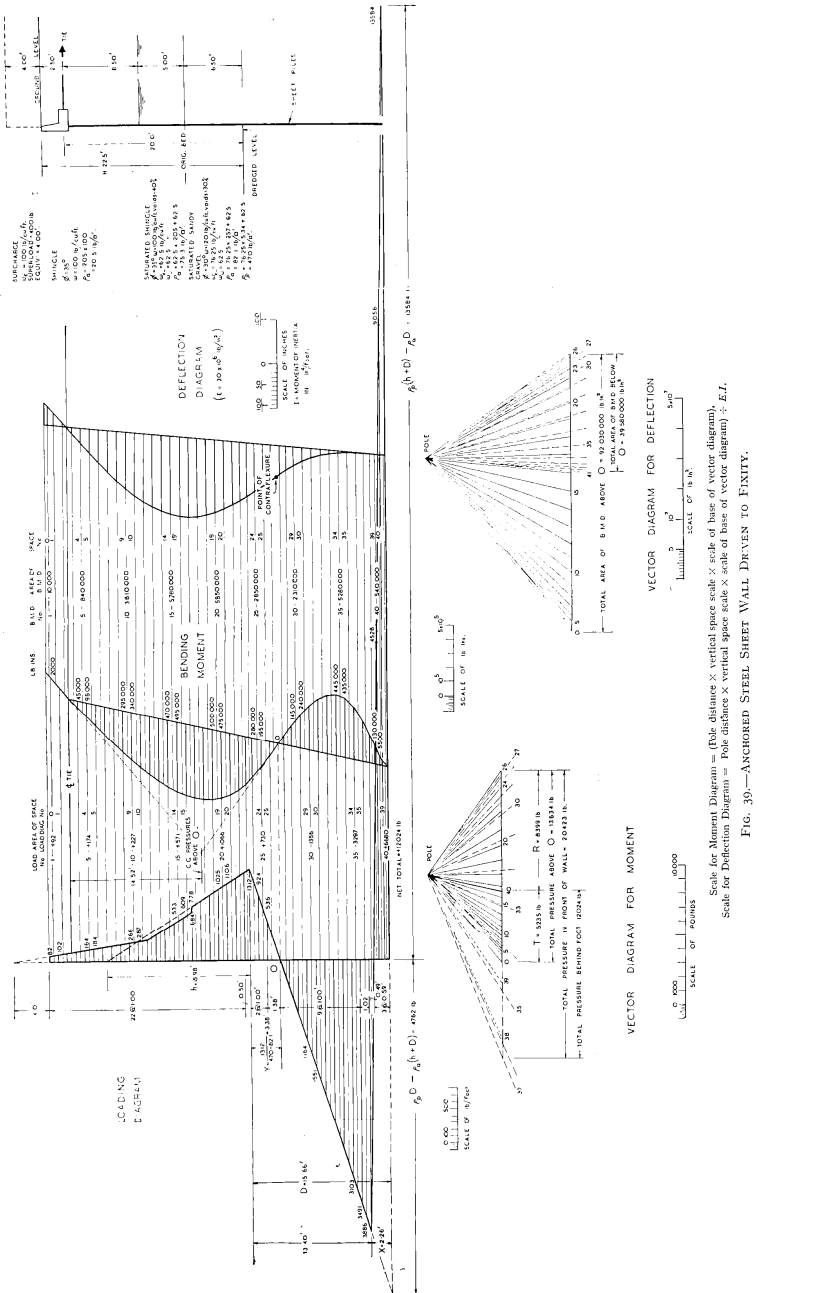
ANCHORED STEEL SHEET WALL DRIVEN TO FIXITY.
